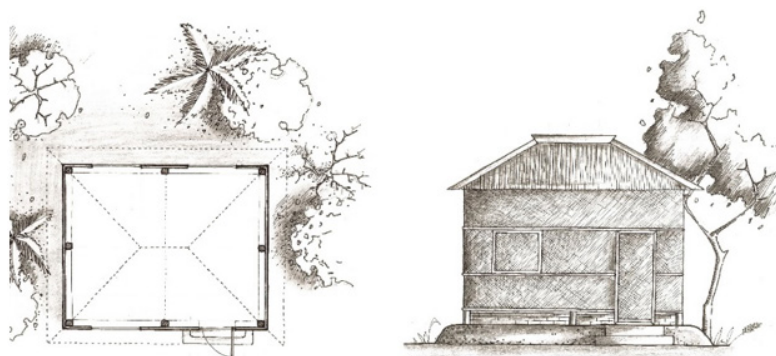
Plan and Elevation of Shelter projects implemented by BDRCS (Source: Shelter Cluster)
